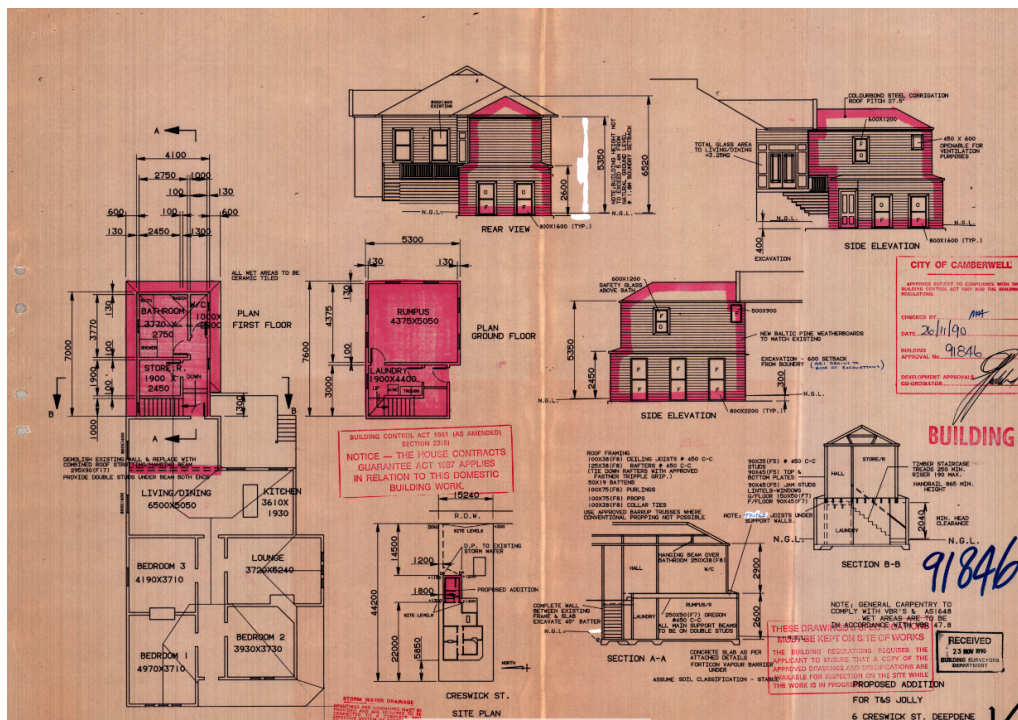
Building plans from 1990, showing a rear extension to the house, providing a bathroom and store at the main floor level and a rumpus room below. (Source: City of Camberwell, BP 91846)
